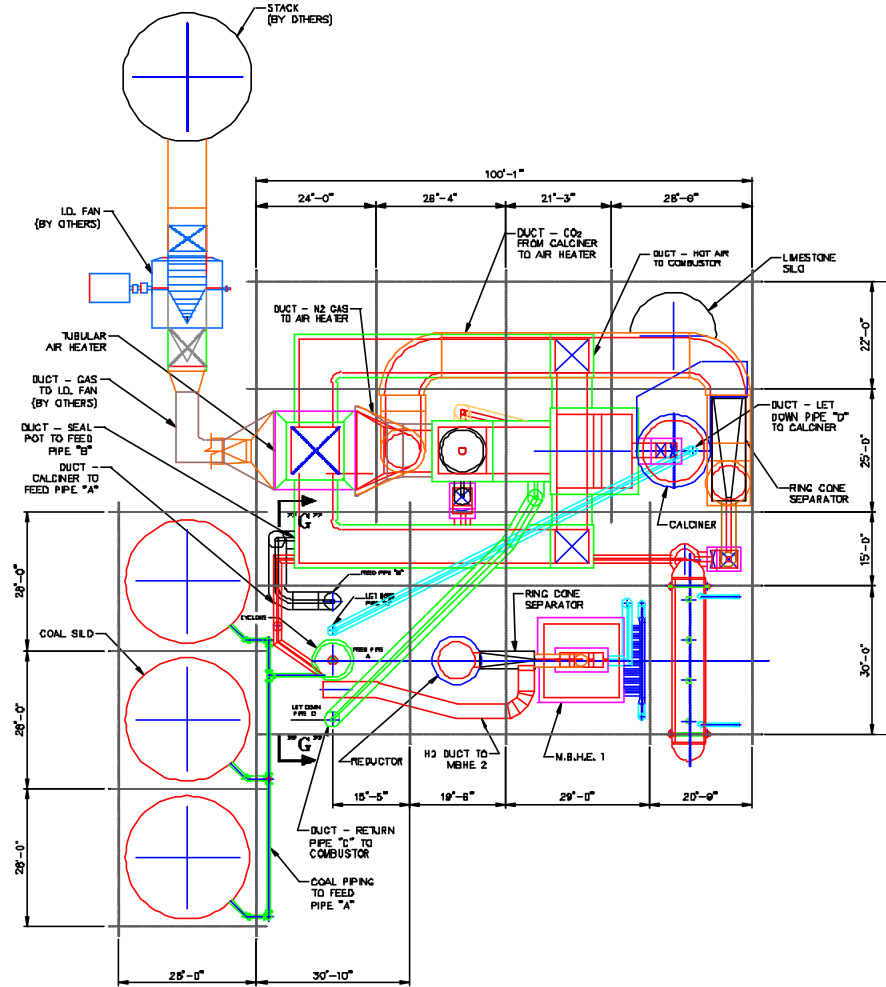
4: Case-13 Gasifier Island General Arrangement Drawing – Plan View
